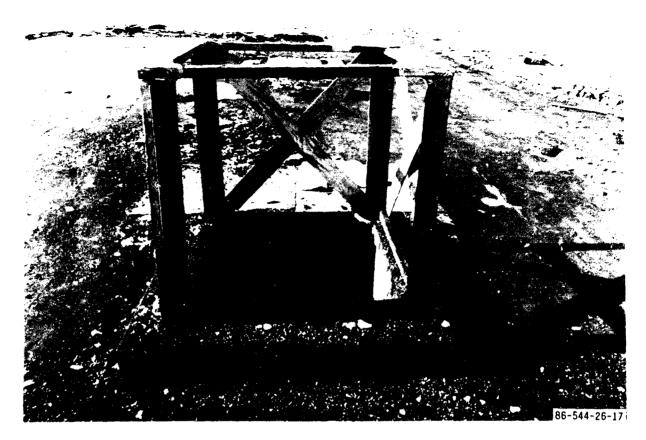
A typical opening made in the roof through which roofing material could be dropped into bins.
